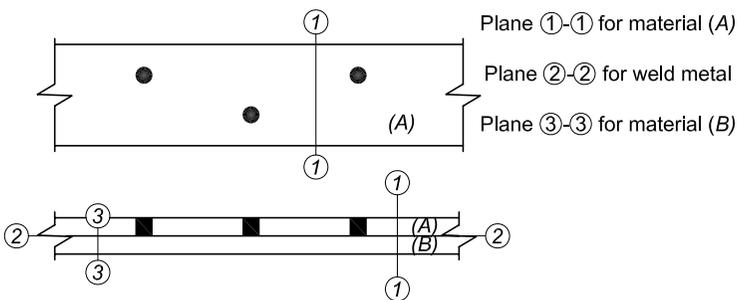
Shear planes for fillet welds loaded in longitudinal shear.
